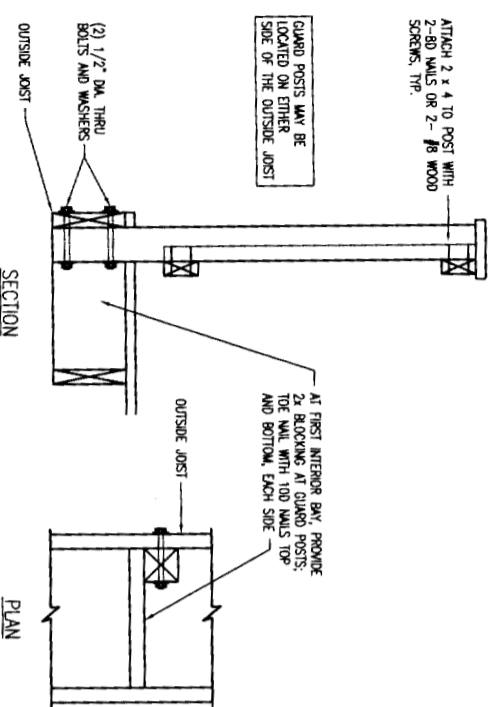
GUARD POST TO OUTSIDE JOIST DETAIL
